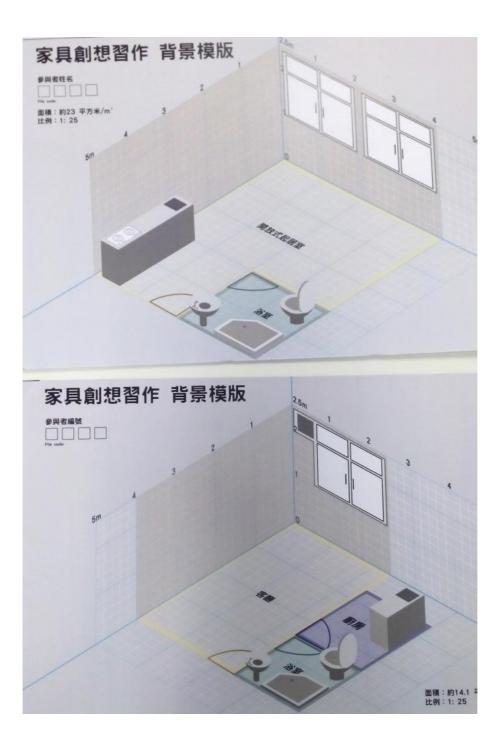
A set of two floor plan templates, illustrating two common floor areas (14 m² and 23 m²) for one to two seniors living in Hong Kong. The 14 m² plan was a standard type of public housing for one to two persons. The 23 m² plan had an open plan kitchen provided on the private market.
